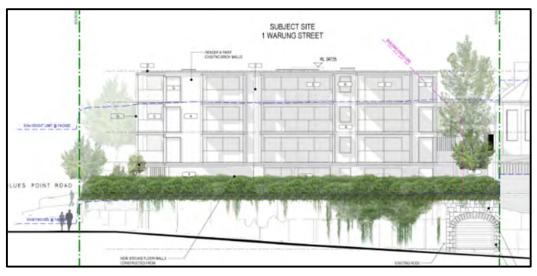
Extract of south elevation (Warung St frontage) showing LEP 8.5m height line (Source: Squillace Architecture, Project No. HIG2009)
